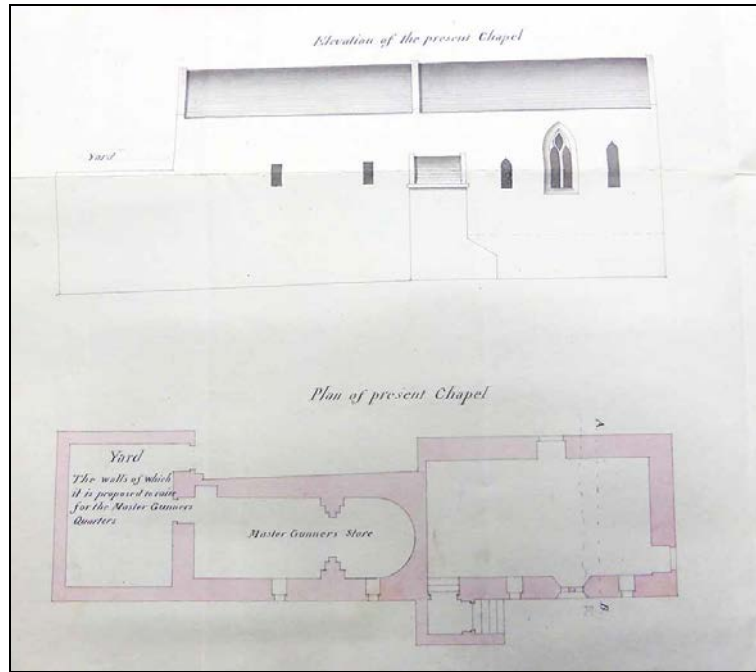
Plan of the chapel in 1805 (NA WO55/818).
